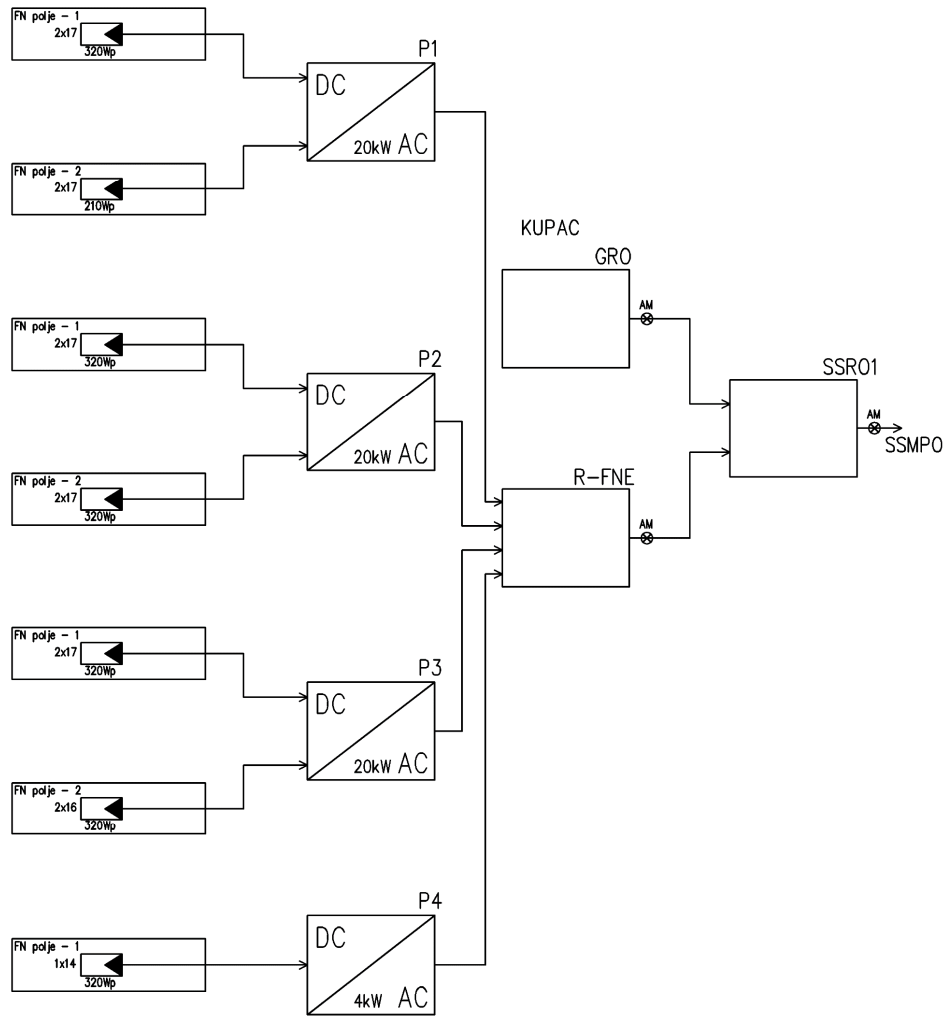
Connection scheme of Photovoltaic power plant of UNISB building
